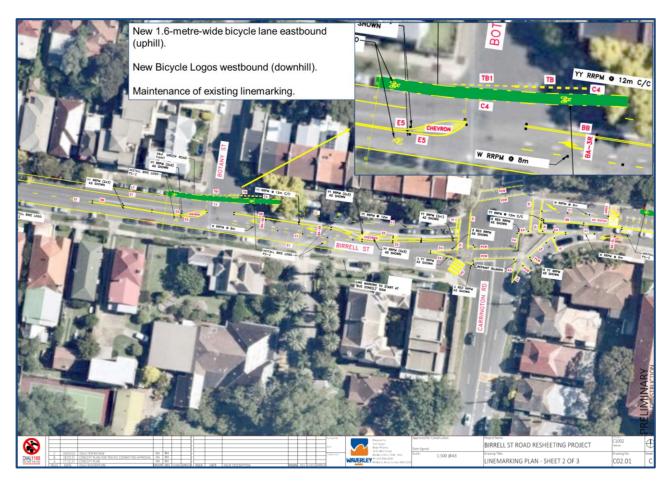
Line marking plan along Birrell Street west of Carrington Road.
